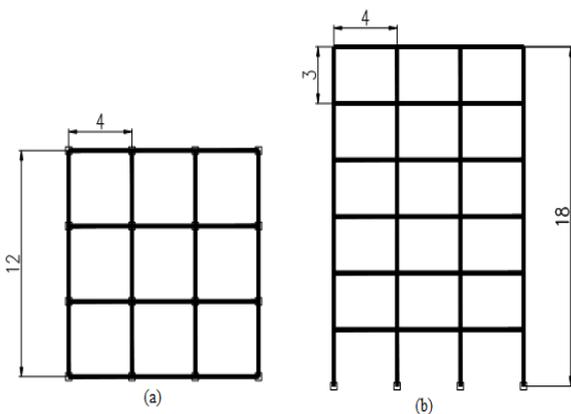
Schematic representation: (a) plan (b) elevation of 6 storey building
